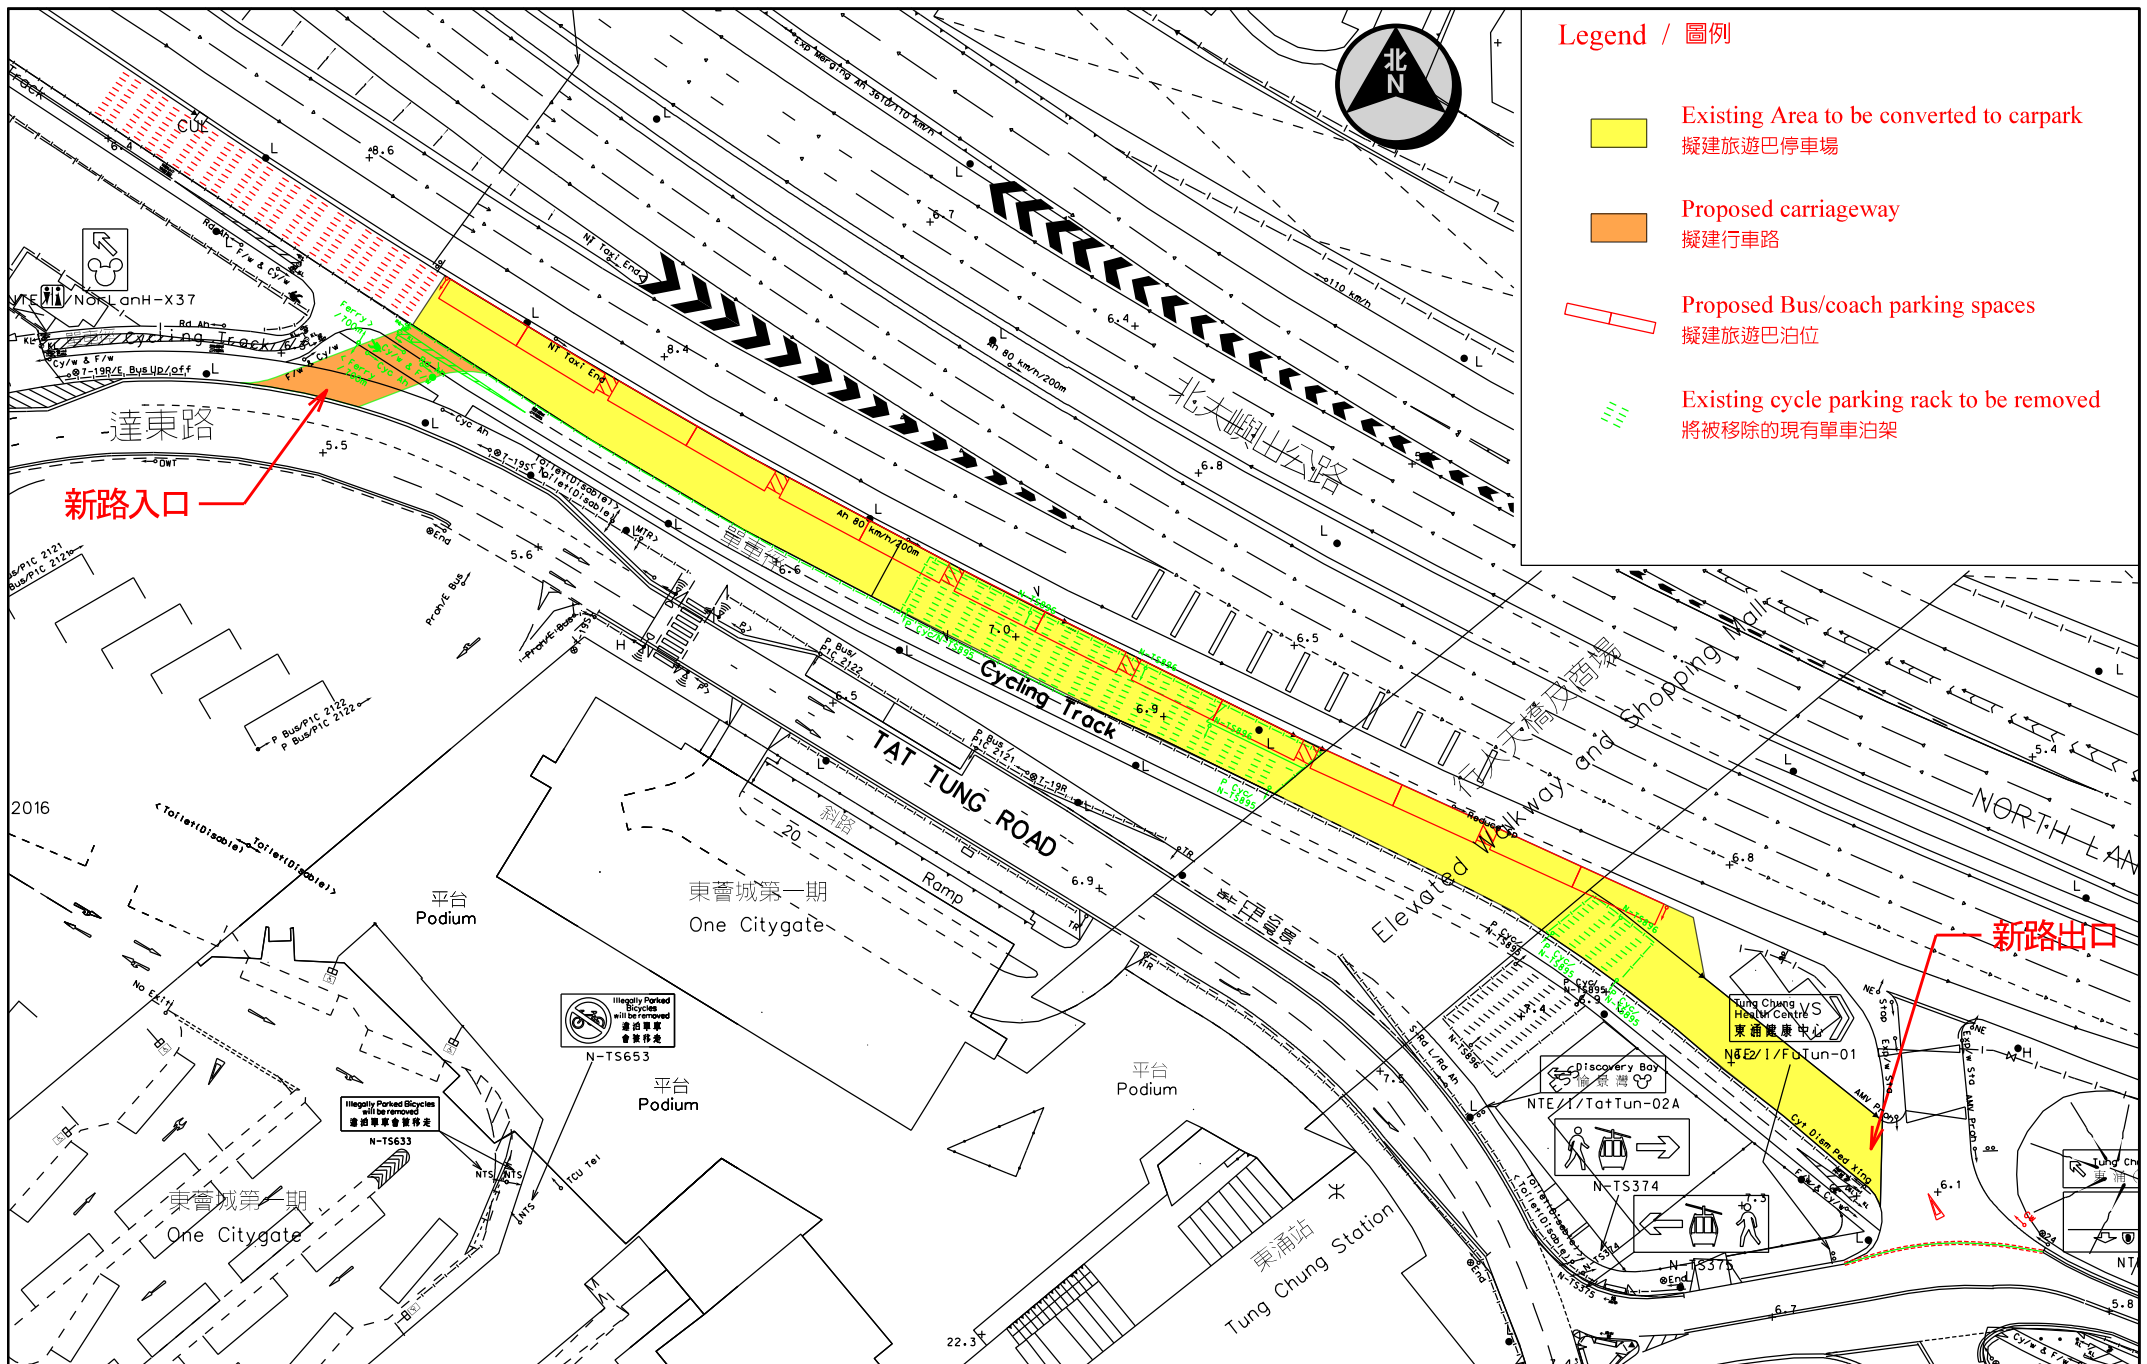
Proposed coach parking spaces at existing cycle parking area near One Citygate at Tat Tung Road
